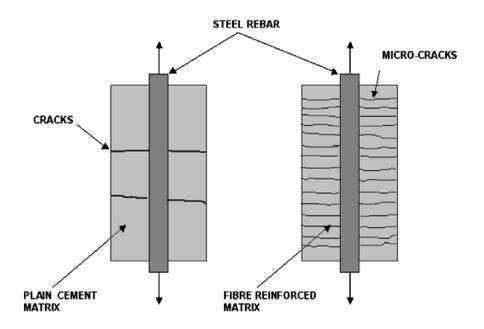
Crack pattern in reinforced concrete and fibre reinforced concrete elements subjected to tension.
